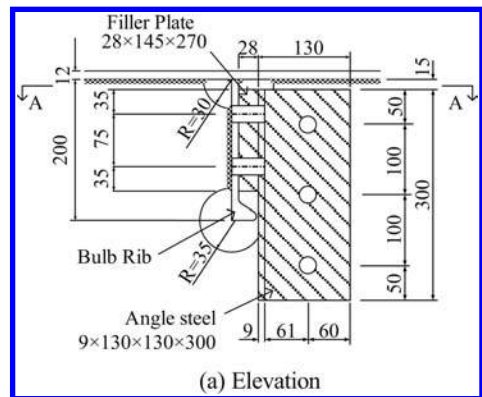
Intersection of bulb rib and lateral rib with angle steel reinforcements.
